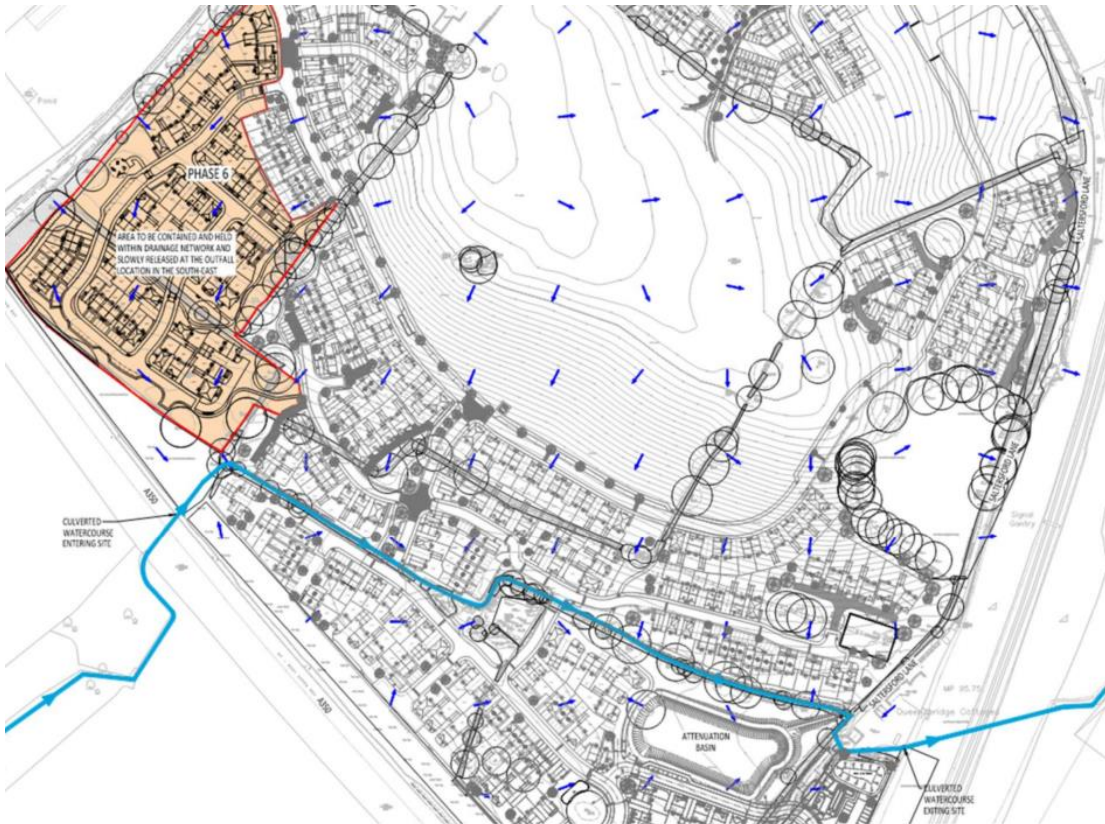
Image above from Page 1 demonstrates routing of watercourse, notes 2 areas of culverting:
